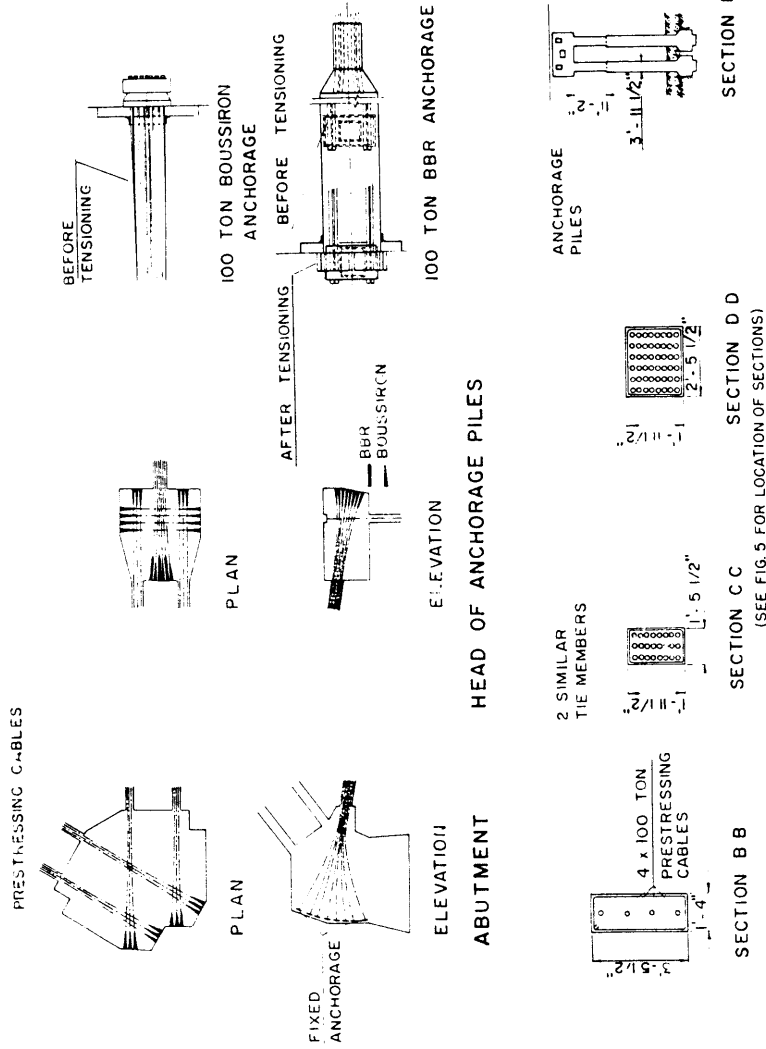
SECTIONS AND DETAILS OF ANCHORAGE FOR ABUTMENTS.
